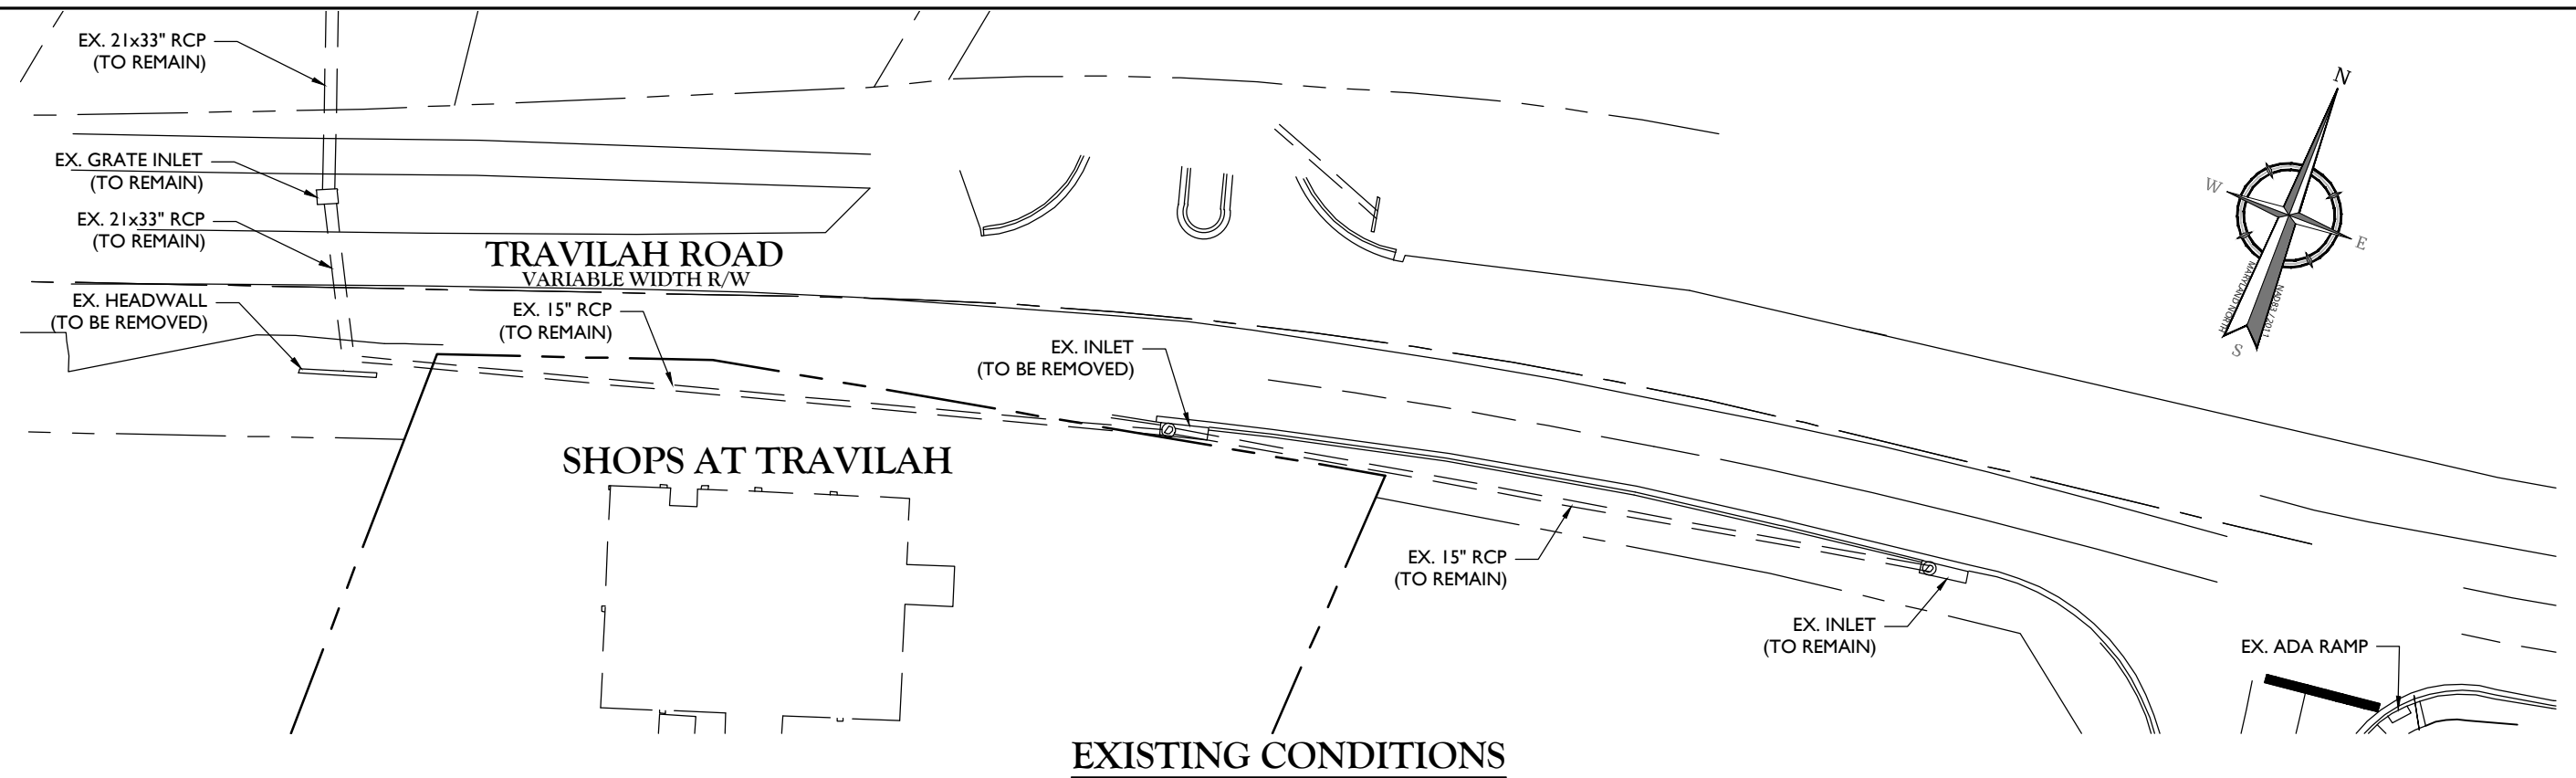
EXHIBIT - PROPOSED DOT STORM DRAIN IMPROVEMENTS
